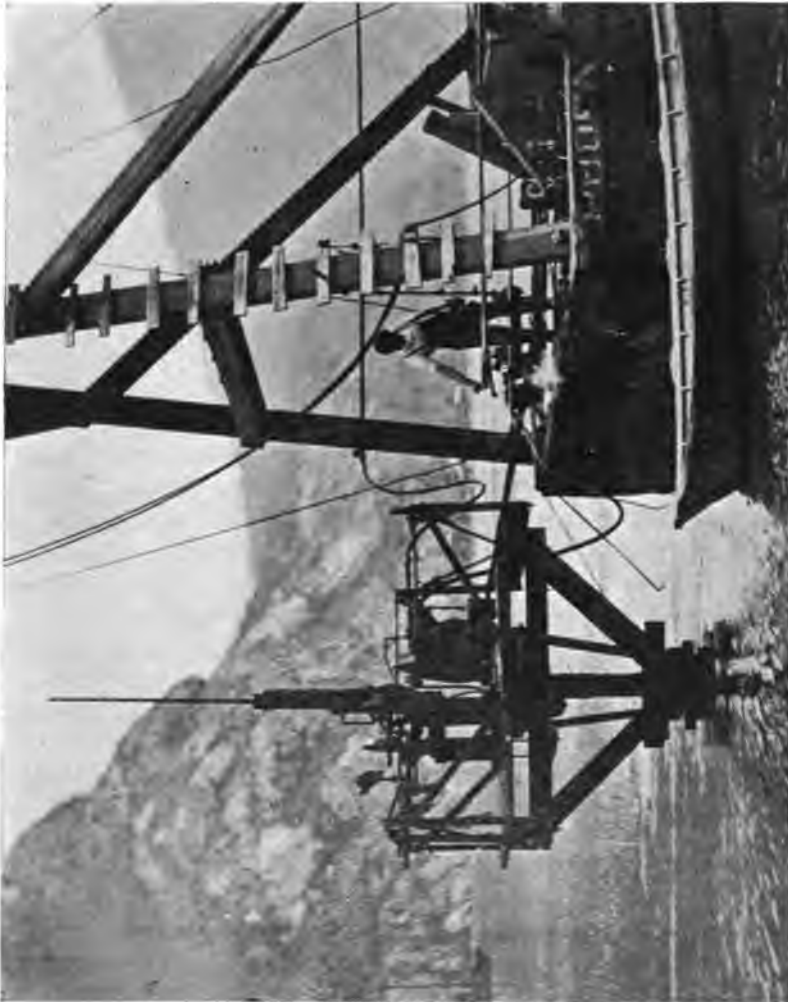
Diamond Drill Mounted on Casing of Bore Hole near Hudson Siphon and Attendant Scow.
